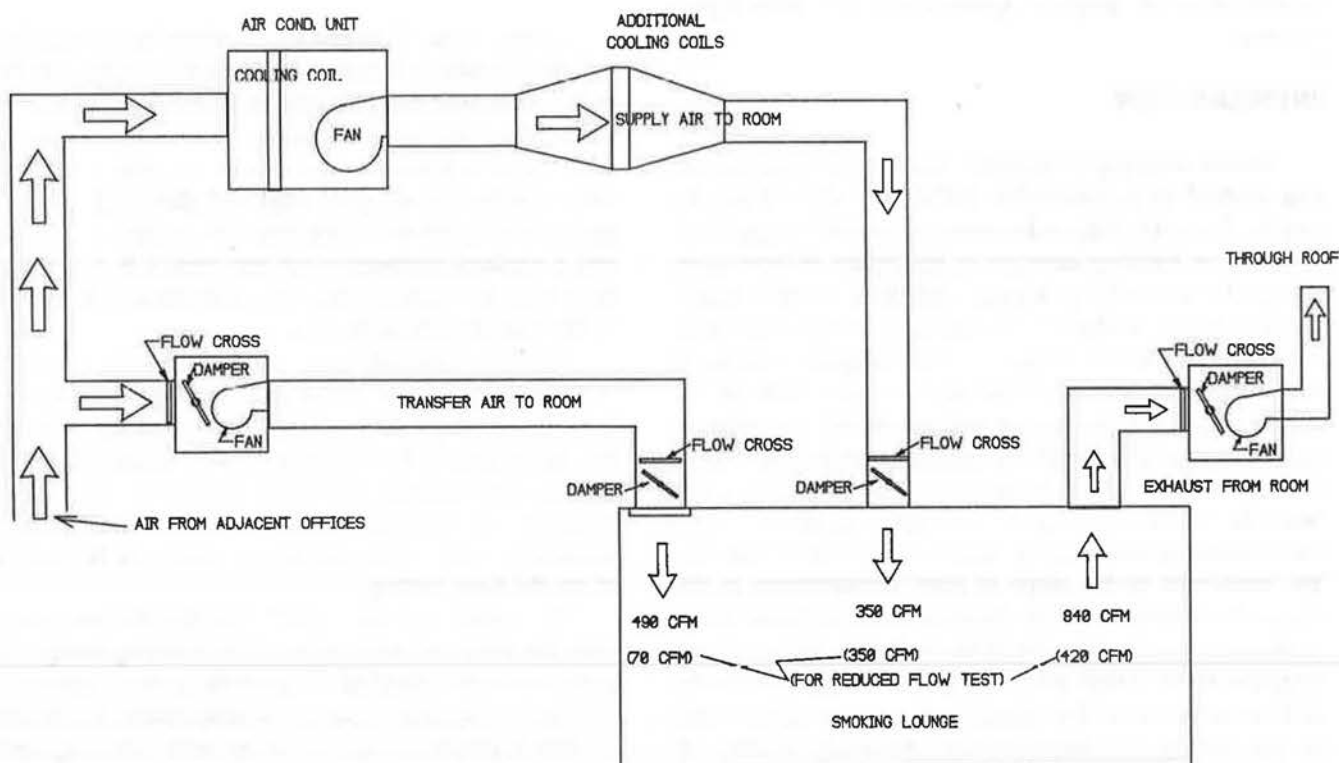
Schematic drawing showing duct arrangement and airflows to the test room used for the smoking lounge study.
